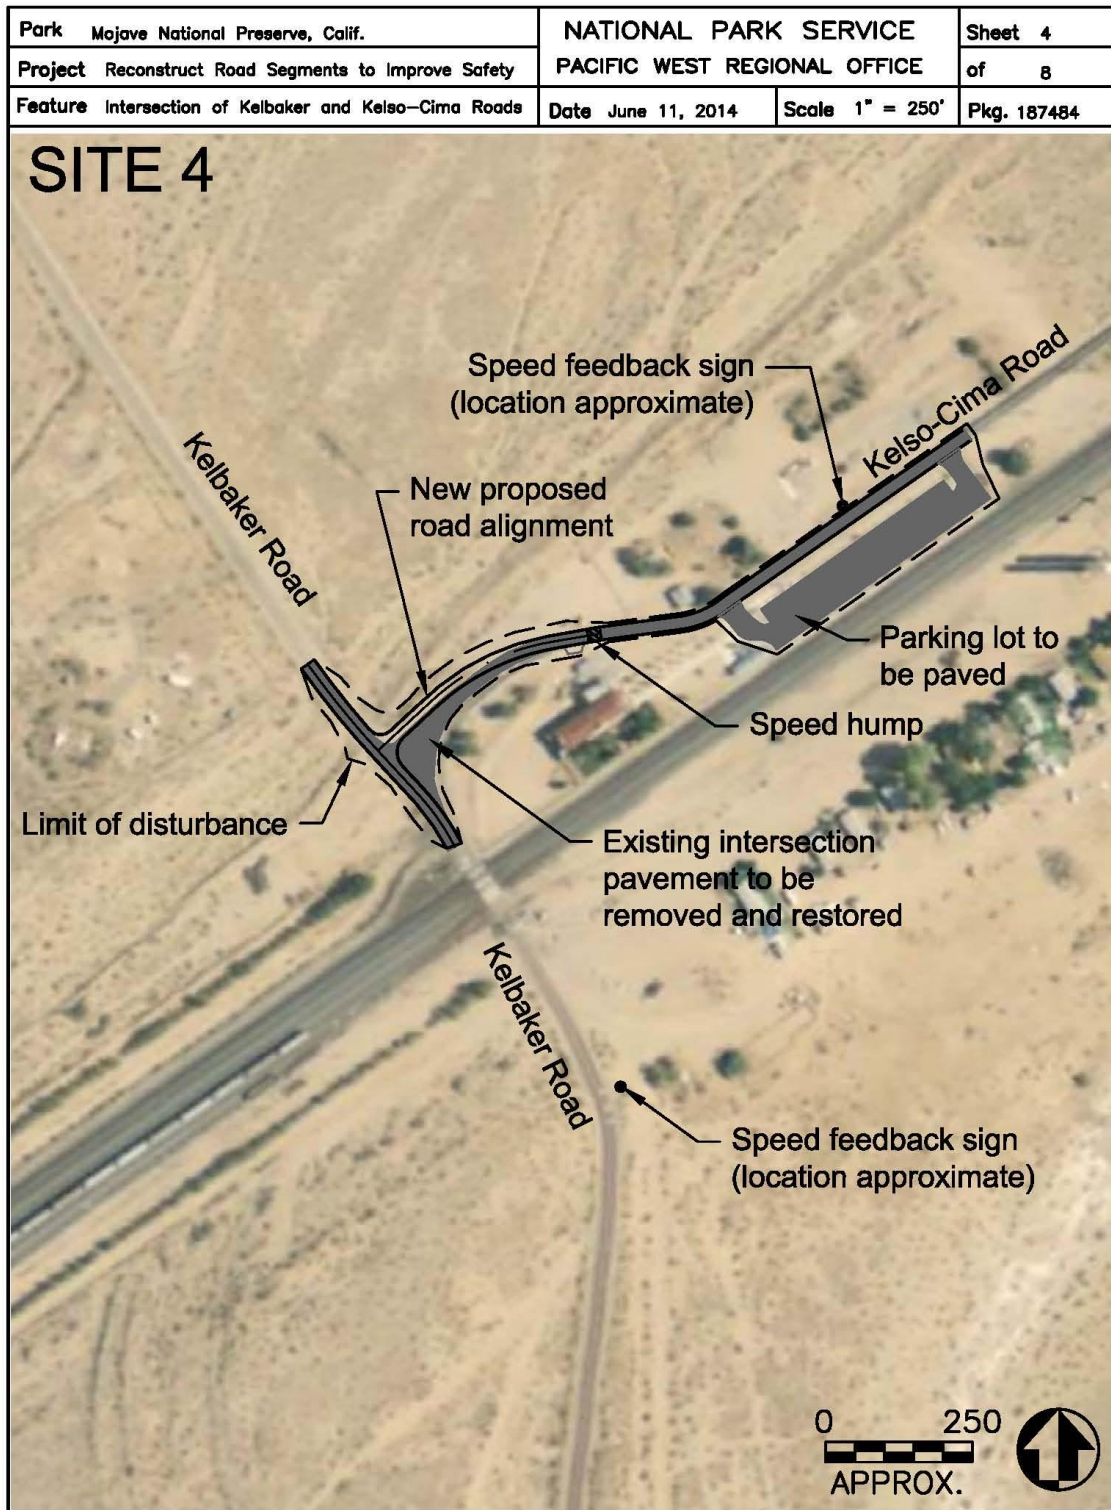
Intersection of Kelbaker Road and Kelso-Cima Road (Site 4)
